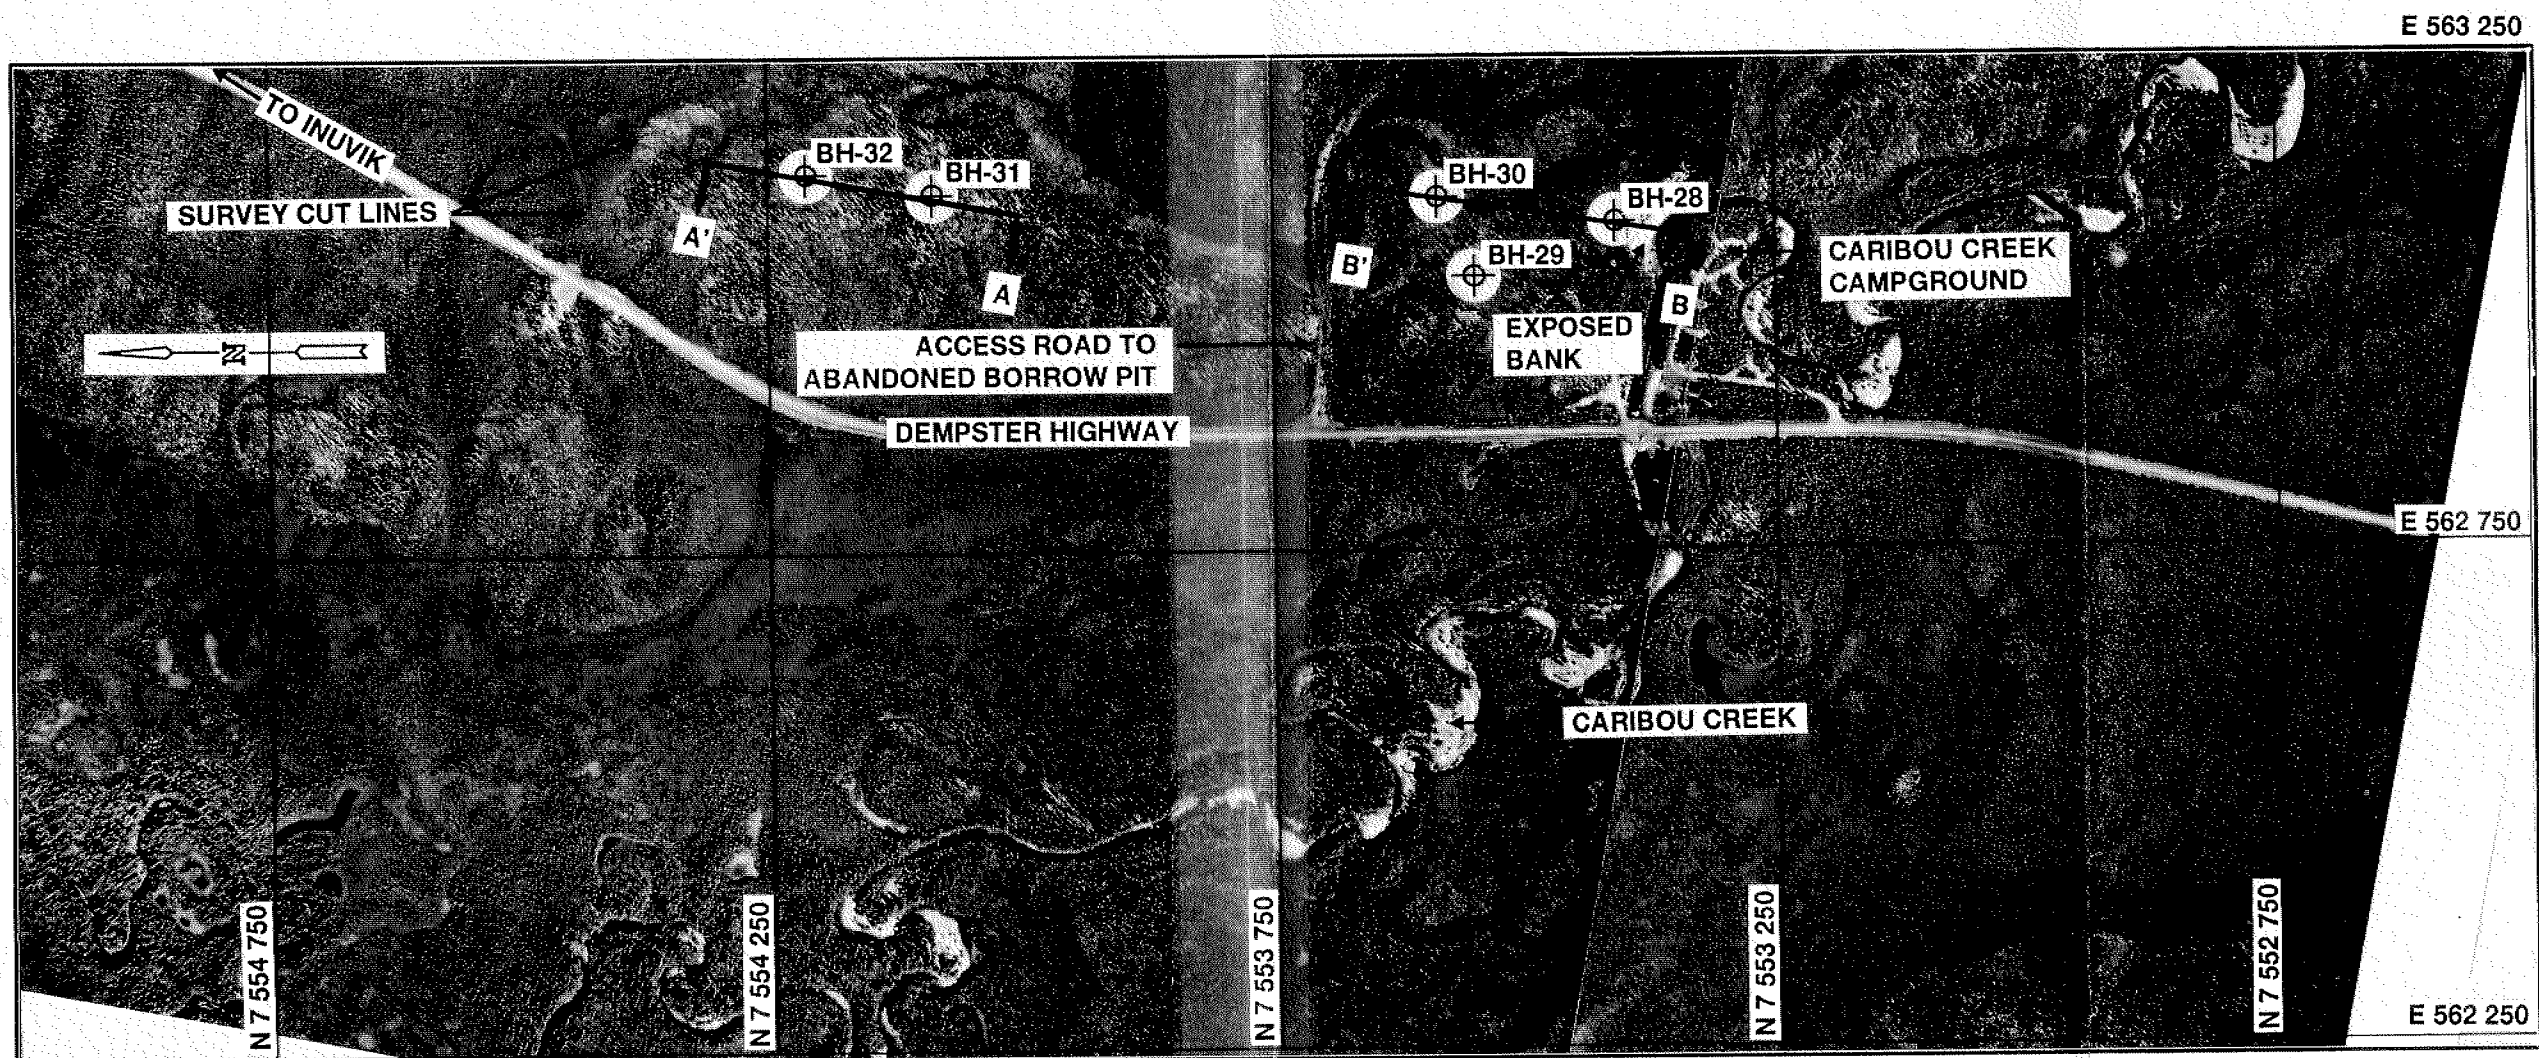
SITE PLAN AND BOREHOLE LOCATIONS
